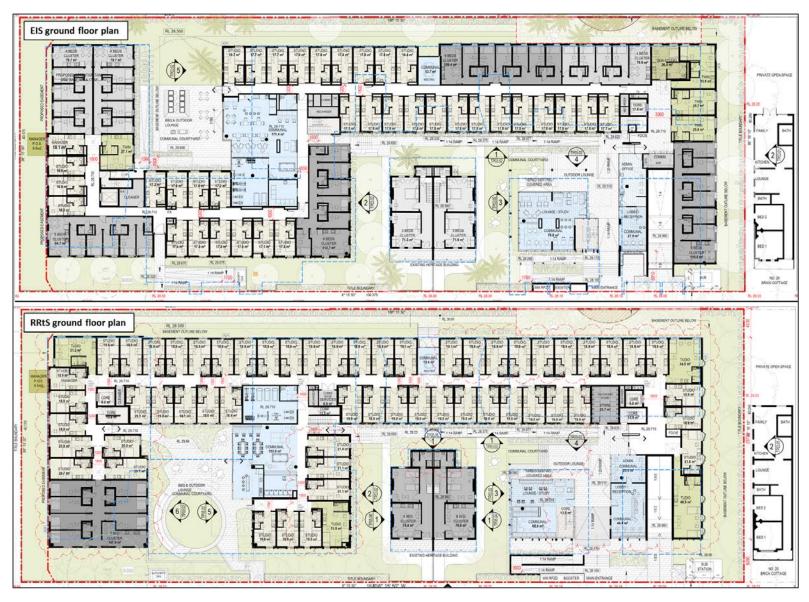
| EIS (top) and RRFI (bottom) ground floor plan (Source: Applicant's EIS and RRFI)
